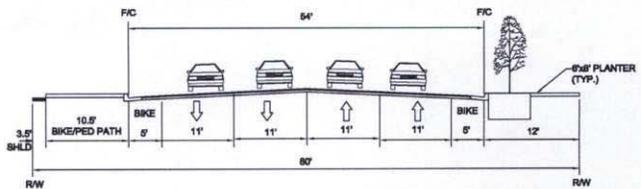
South Park Street Between Crocker St. and Stanford St. (looking east)
